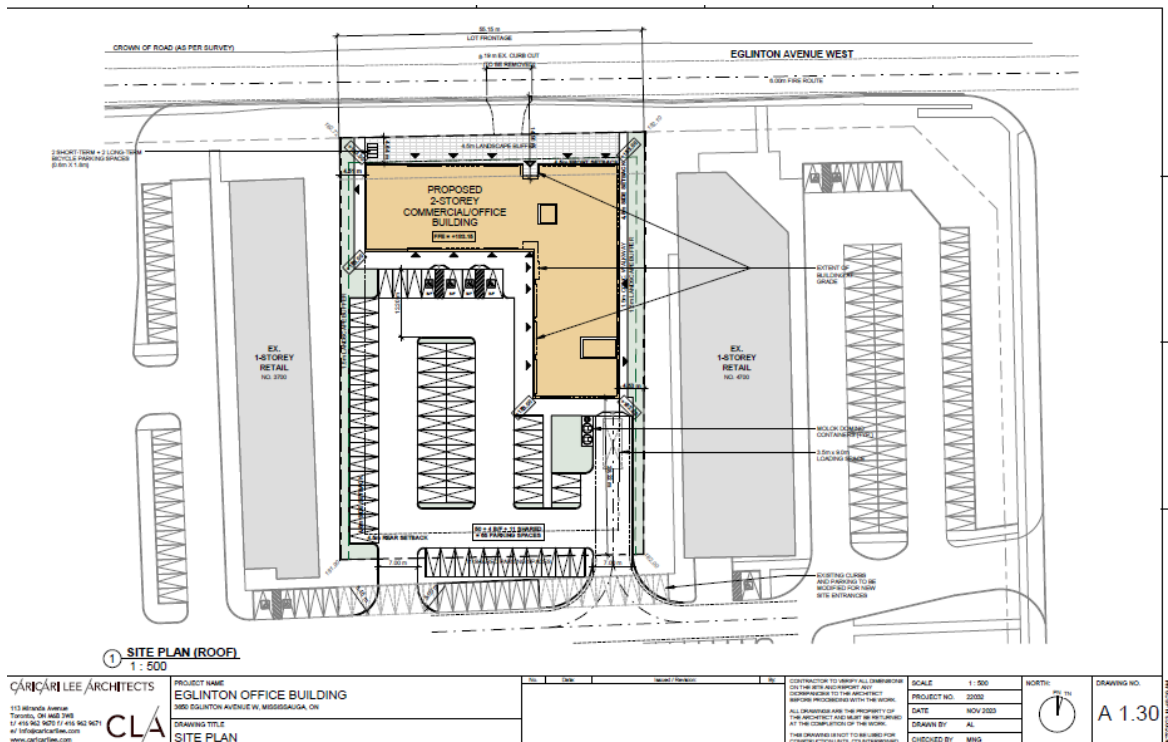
Plan of new commercial/office building and parking areas. (Plan from owner, November 2023)
